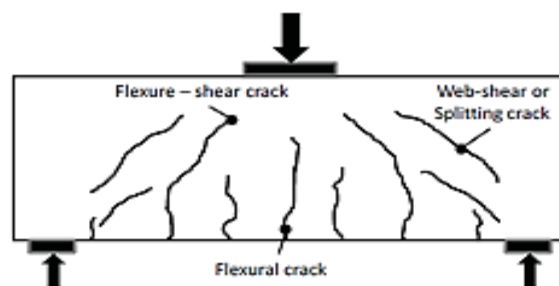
Types of cracks in reinforced concrete deep beams (MacGregor and Wight, 2005)
